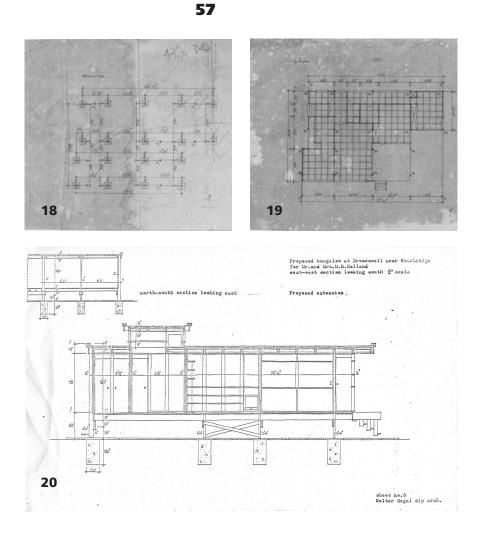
Foundations Plan, Novem, 1971. Fig. 20: Sections, Novem, 1971.
